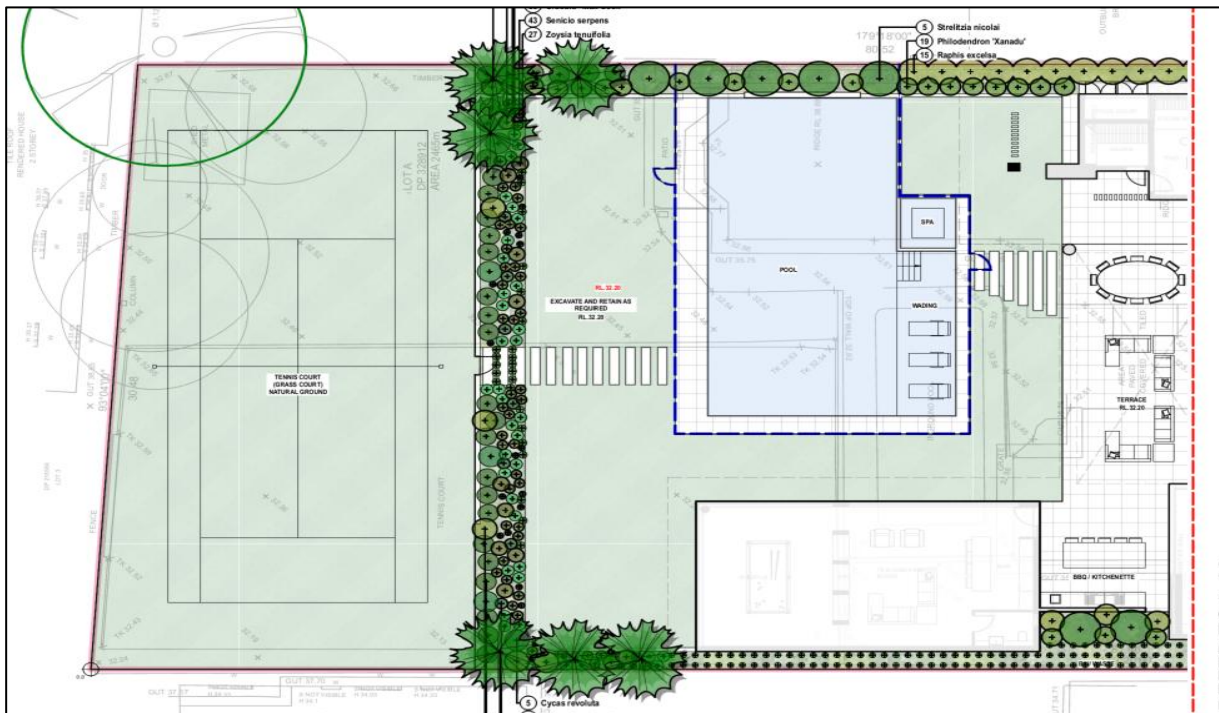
Extract of the applicant's submitted Landscape Plan.
